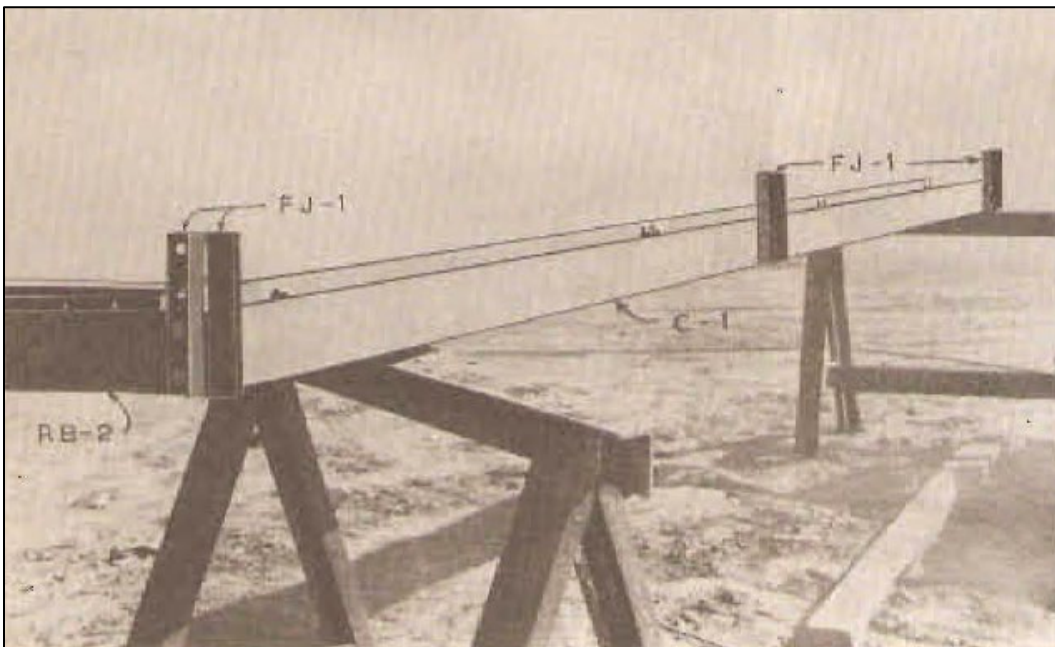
Jig with attached steel rigid frame members as welders are preparing to join two members (Butler Manufacturing Company, "U.S. Navy rigid frame utility warehouse building erection instructions for the 40'-0" x 100'-0" building," Kansas City, MO: Butler Manufacturing Company, 1945).
